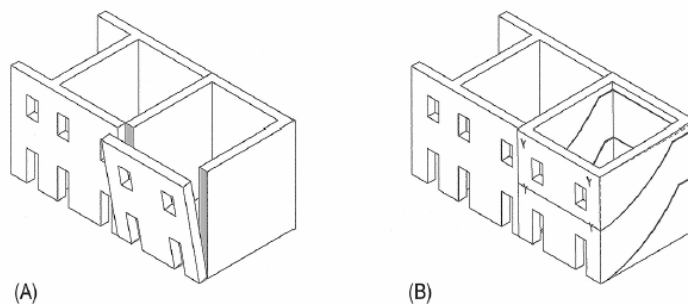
Failure modes for buildings with no ties (a) and with ties anchoring the façade to lateral walls (Carocci, 2001).
